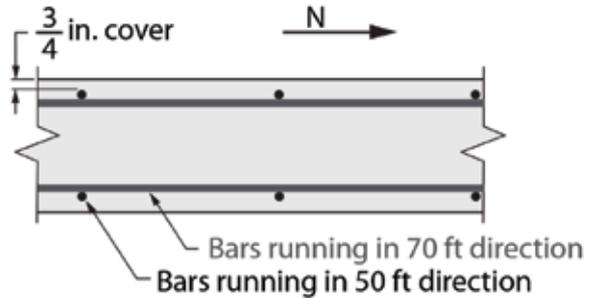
Section of the 8 in. (200 mm) slab (Note: 70 ft = 21.3 m; 3/4 in. = 19 mm)
